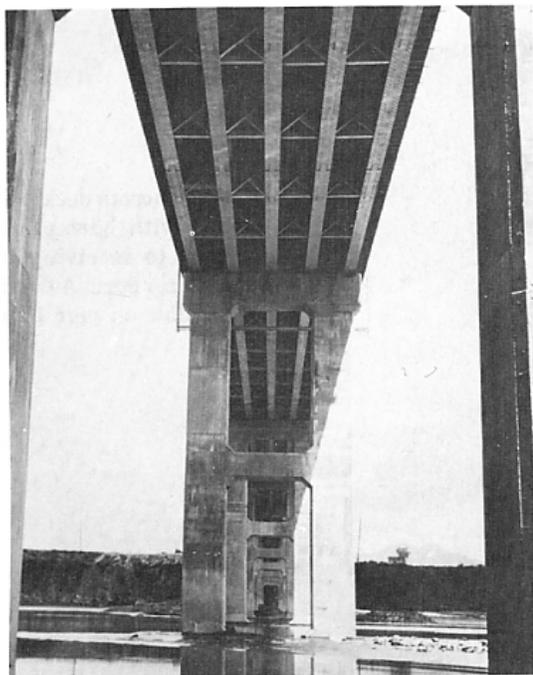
View looking east at the completed piers and superstructure of Libby bridge.
